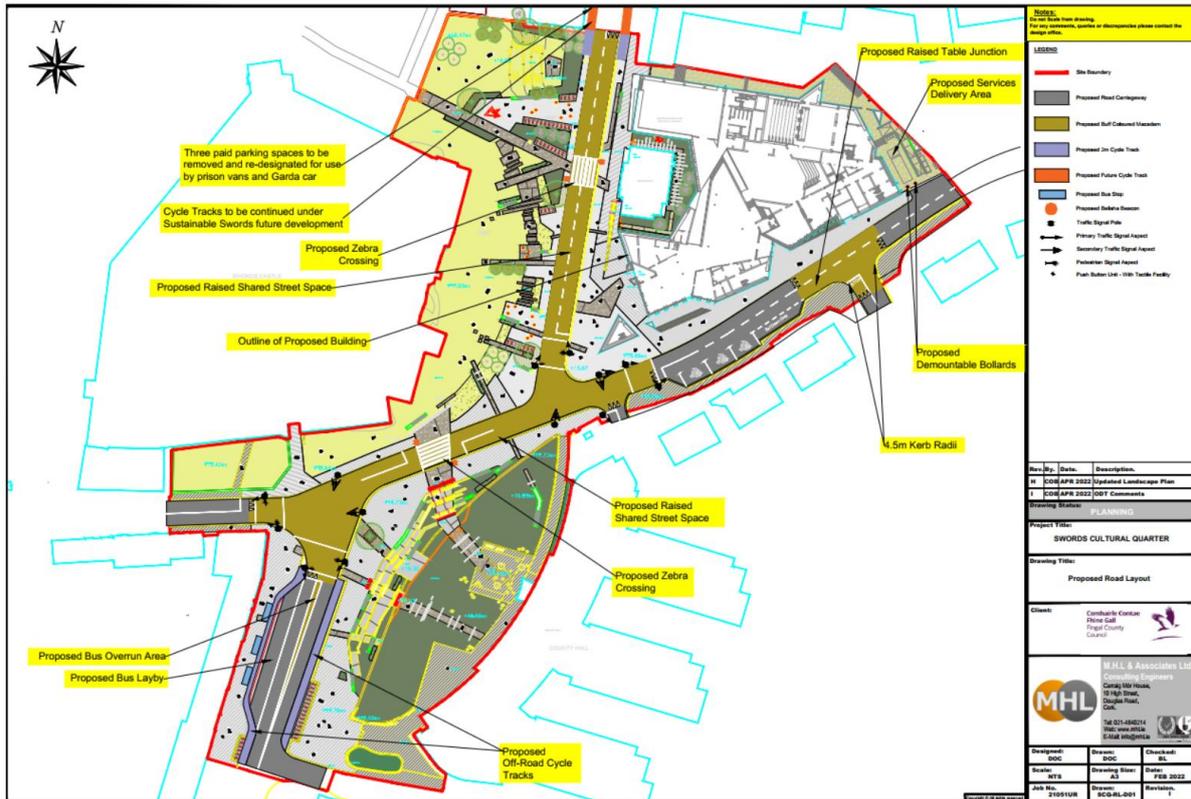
Proposed Street Layout designed for Sustainable Transport with Active Travel Prioritised
